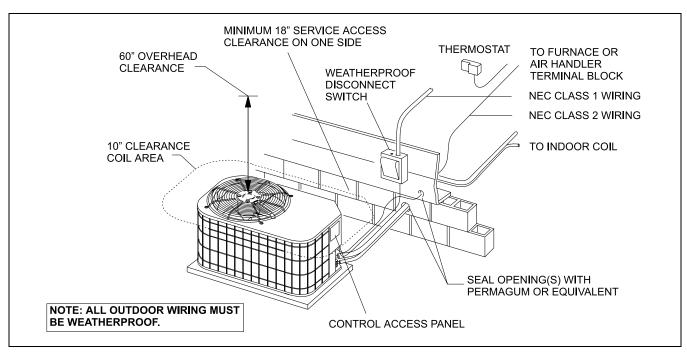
TYPICAL RESIDENTIAL OUTDOOR UNIT LOCATION
